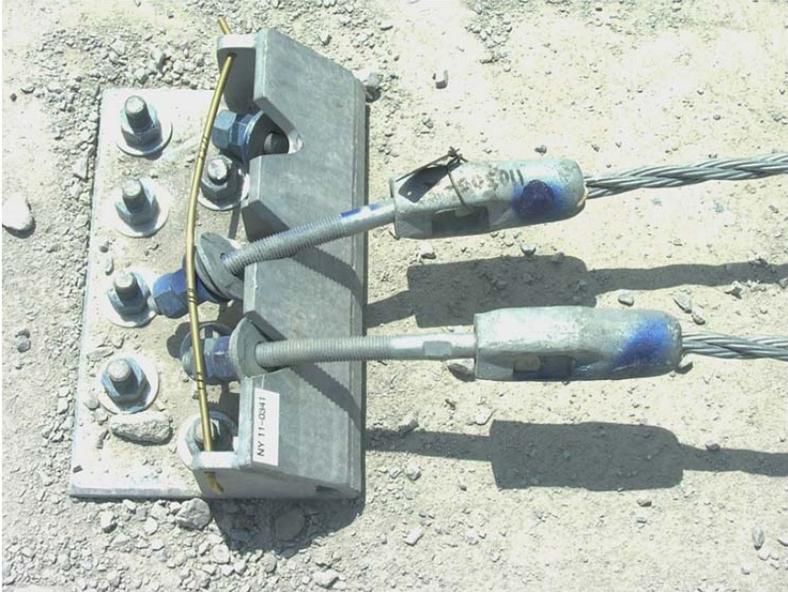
System Damage: Upstream Angle Plate and Top Cable, Test No. NYCC-1
